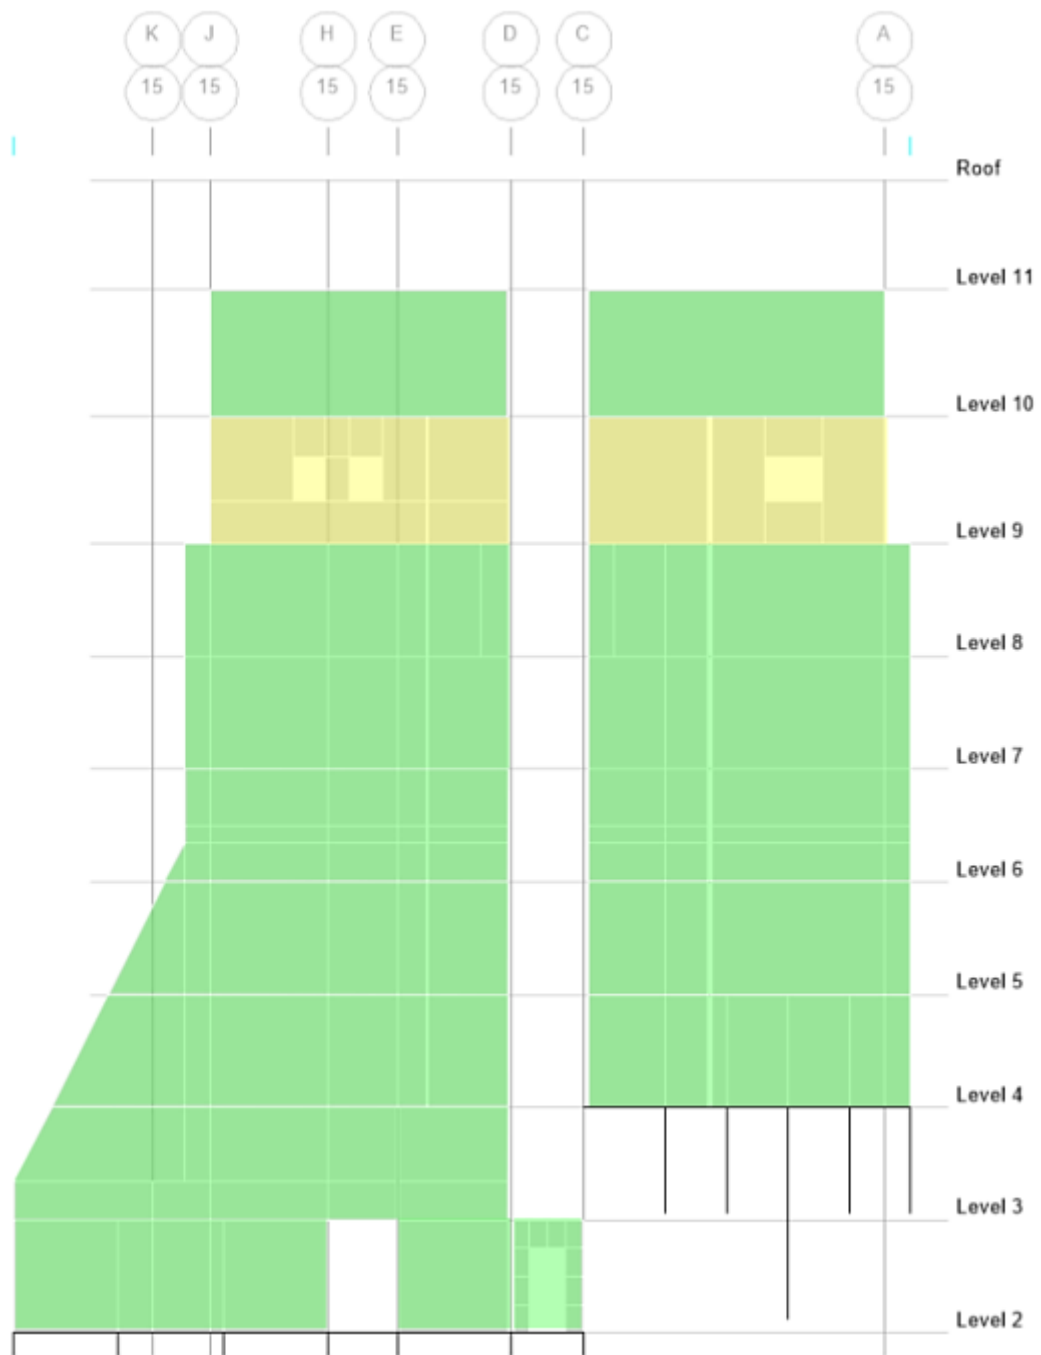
, Gridline 15 Transverse Direction Wall – South Structure
